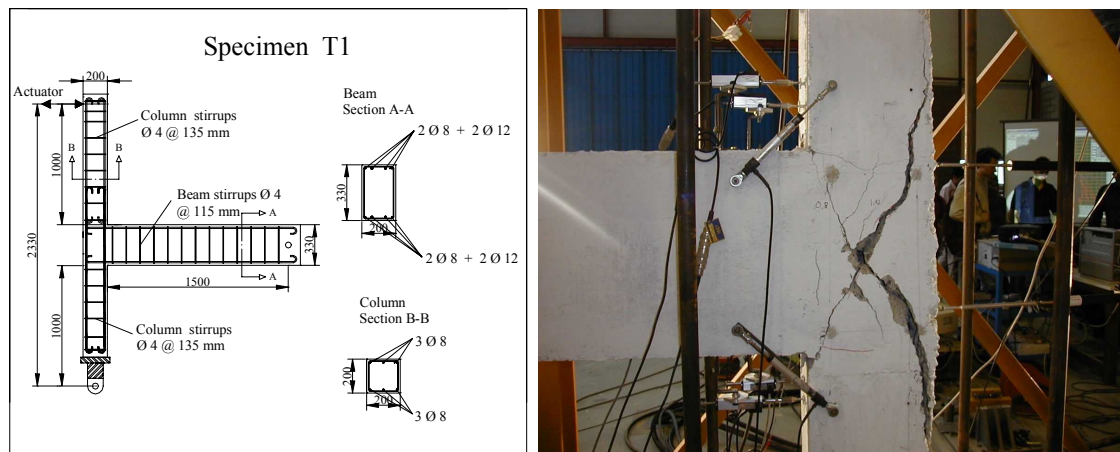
Exterior tee-joint specimen T1 and joint damage ([1])
